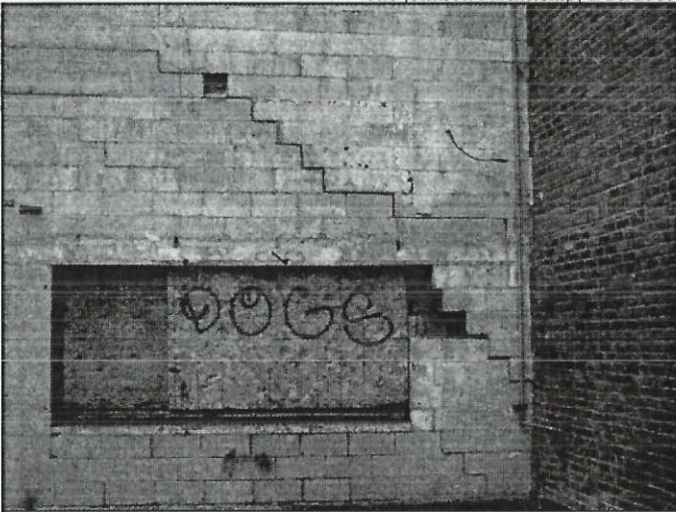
• Structural damage at northeastern corner of 1006 1<sup>st</sup> Ave S
